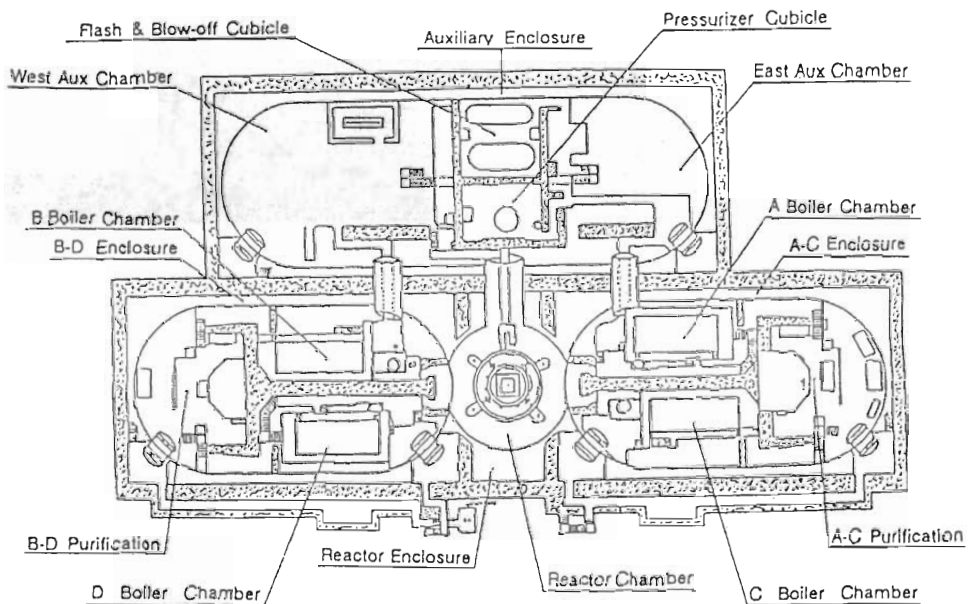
Plan View of Primary Containment Chambers and Concrete Enclosures
